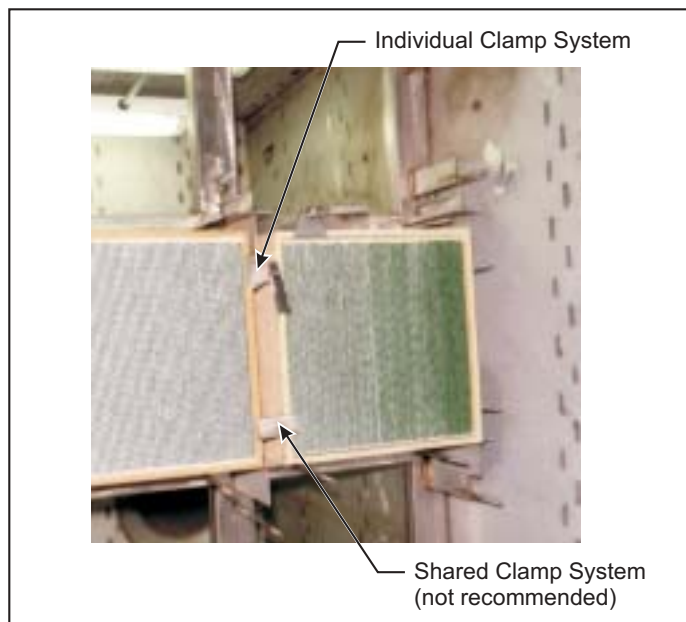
HEPA Filter Mounting Frame (Showing Two Clamp Designs)
